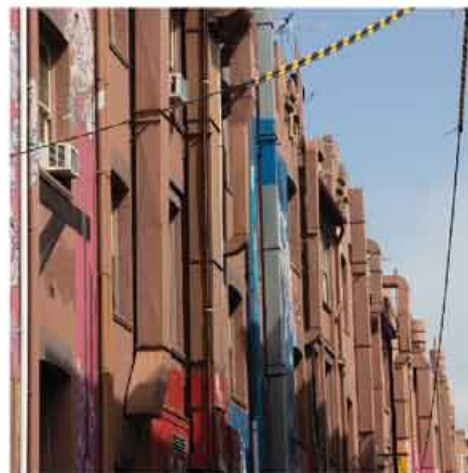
Multiple exposed ducting work running vertically along the Foley Street side of 82-106 Oxford Street, Darlinghurst.
